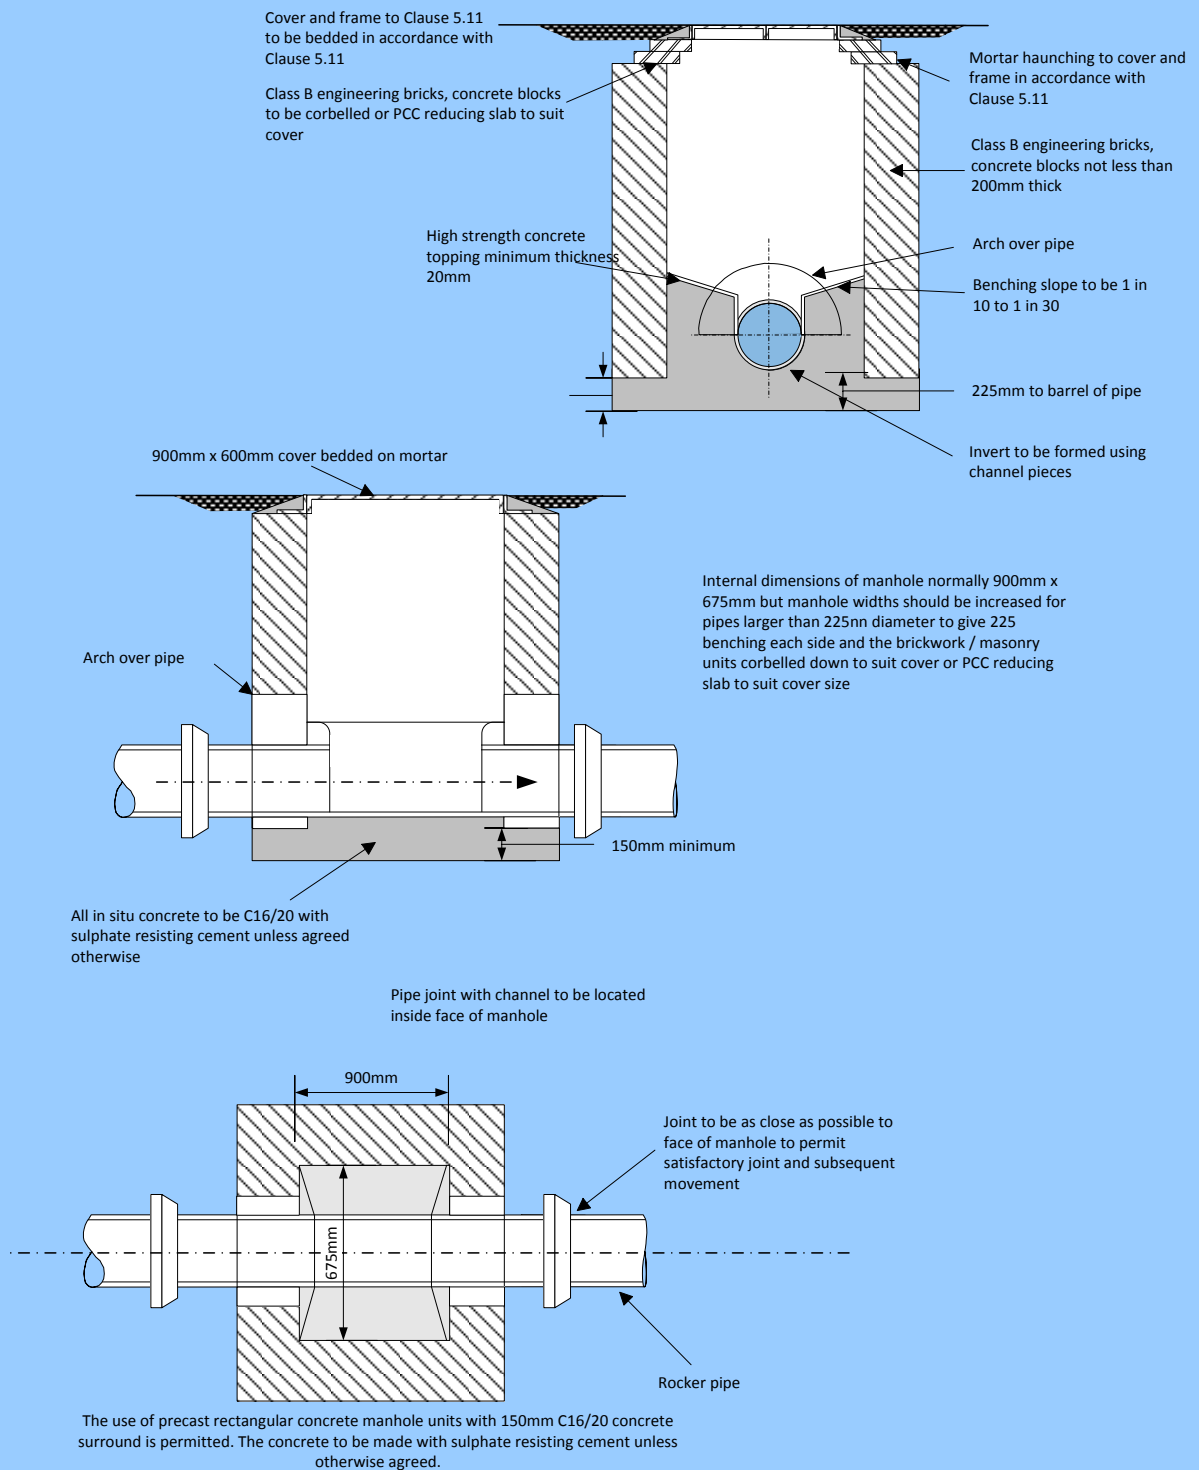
/5 - TYPICAL MANHOLE DETAIL - TYPE E
